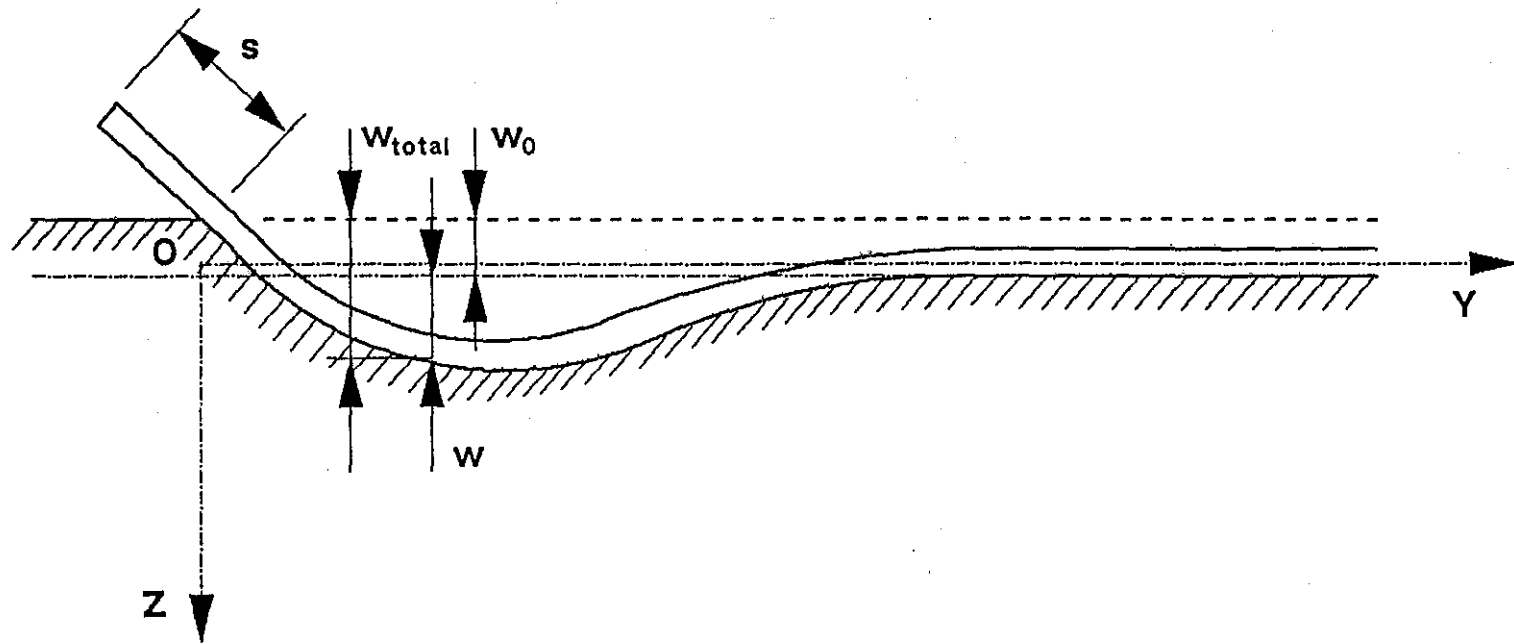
Sketch of an Up-Curled Semi-Infinite Pavement Slab
